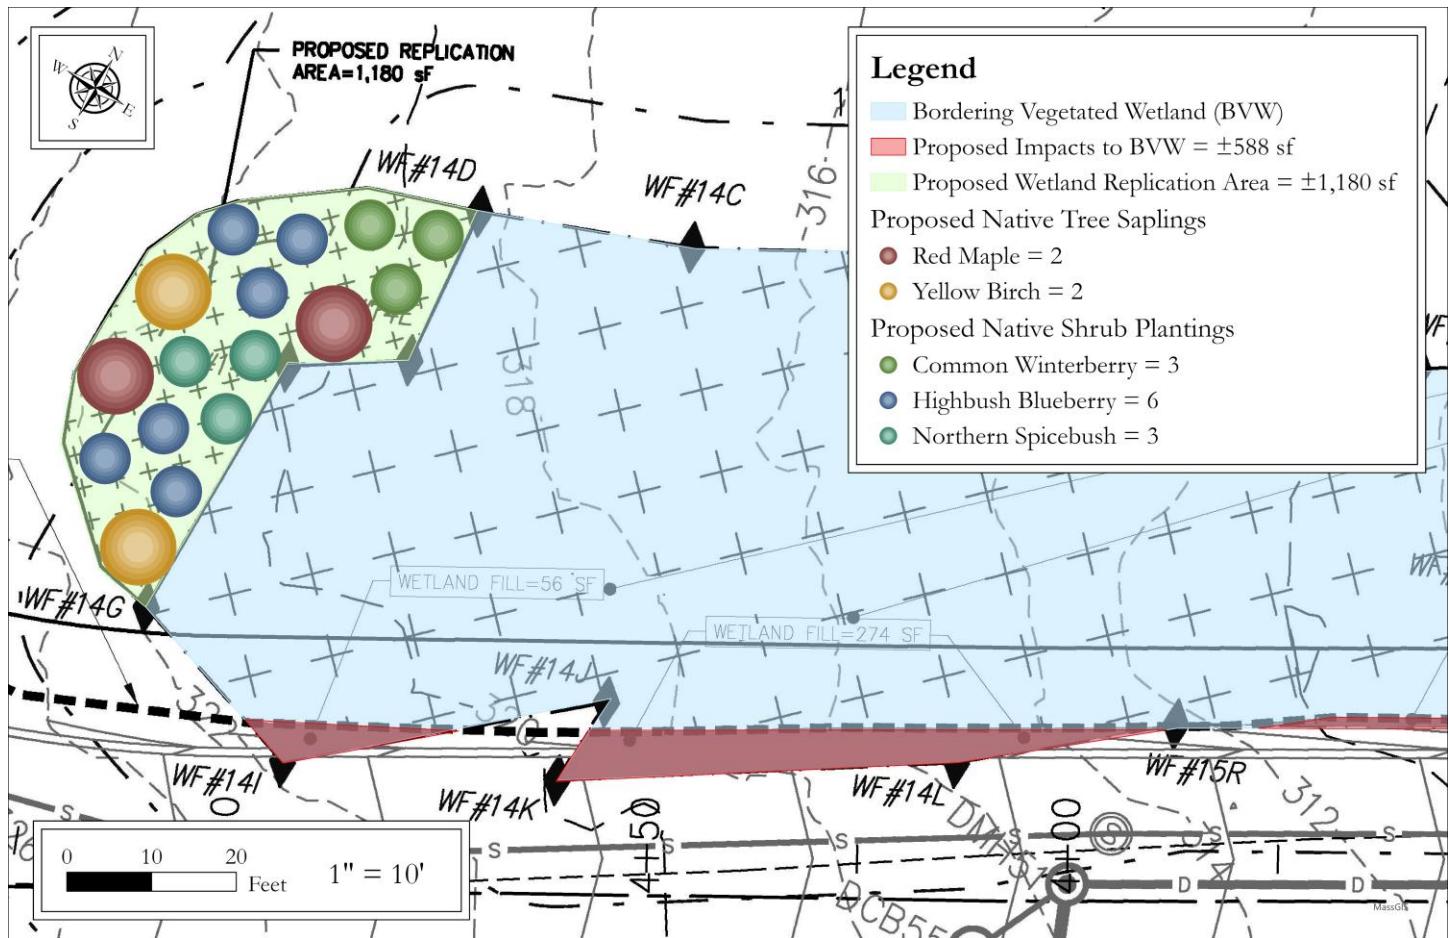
Proposed wetland replication planting plan north of Tessier Lane.
